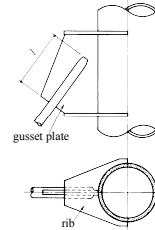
Reinforcement at the Column to Bracing Joint (Solid round bar)
